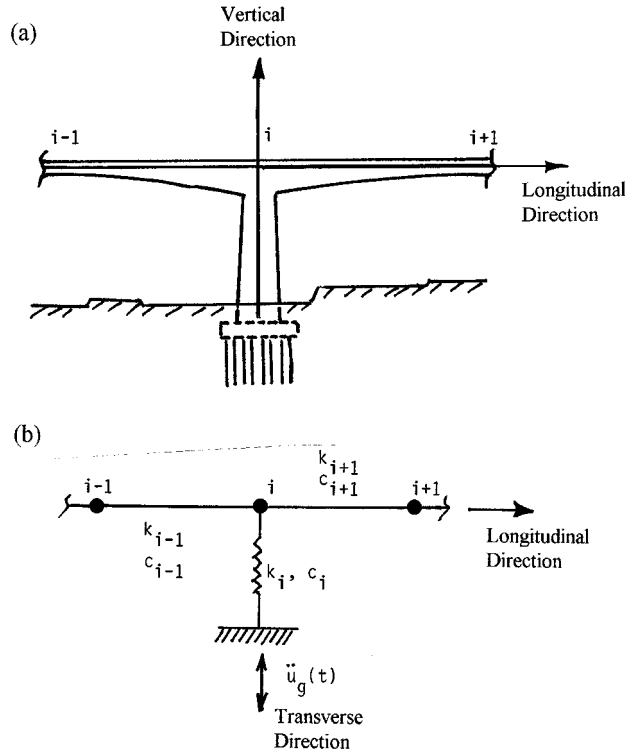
(a) A bridge-girder substructure system, (b) lumped mass model indicates model parameters (stiffness and damping) in each element
